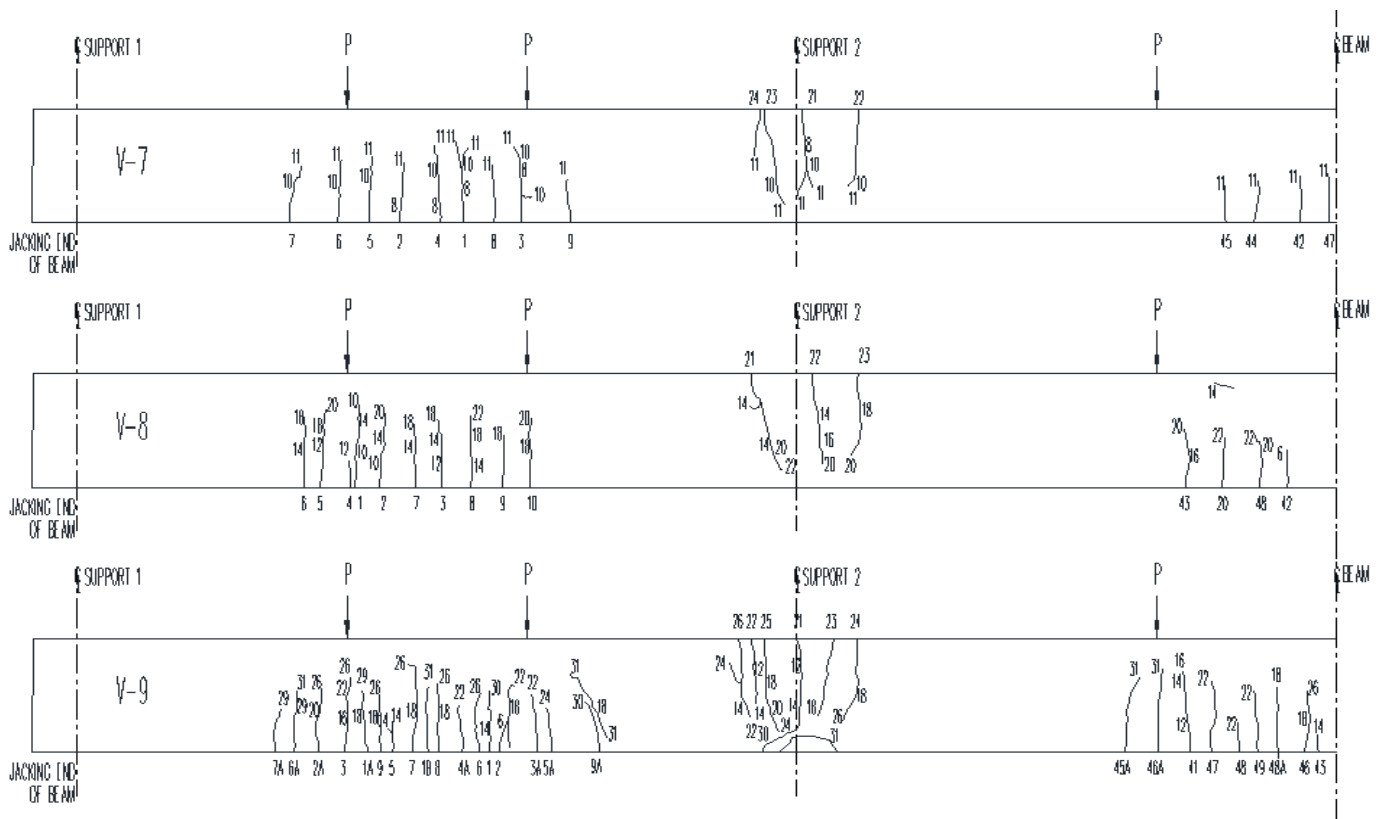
Typical location of cracks in beams V-7, V-8, and V-9 (300 × 150 mm). Half elevation left side.
